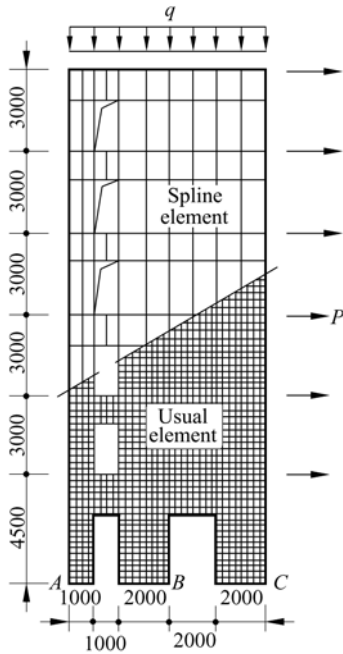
Shear wall with local stagger holes at bottom (unit: mm)
